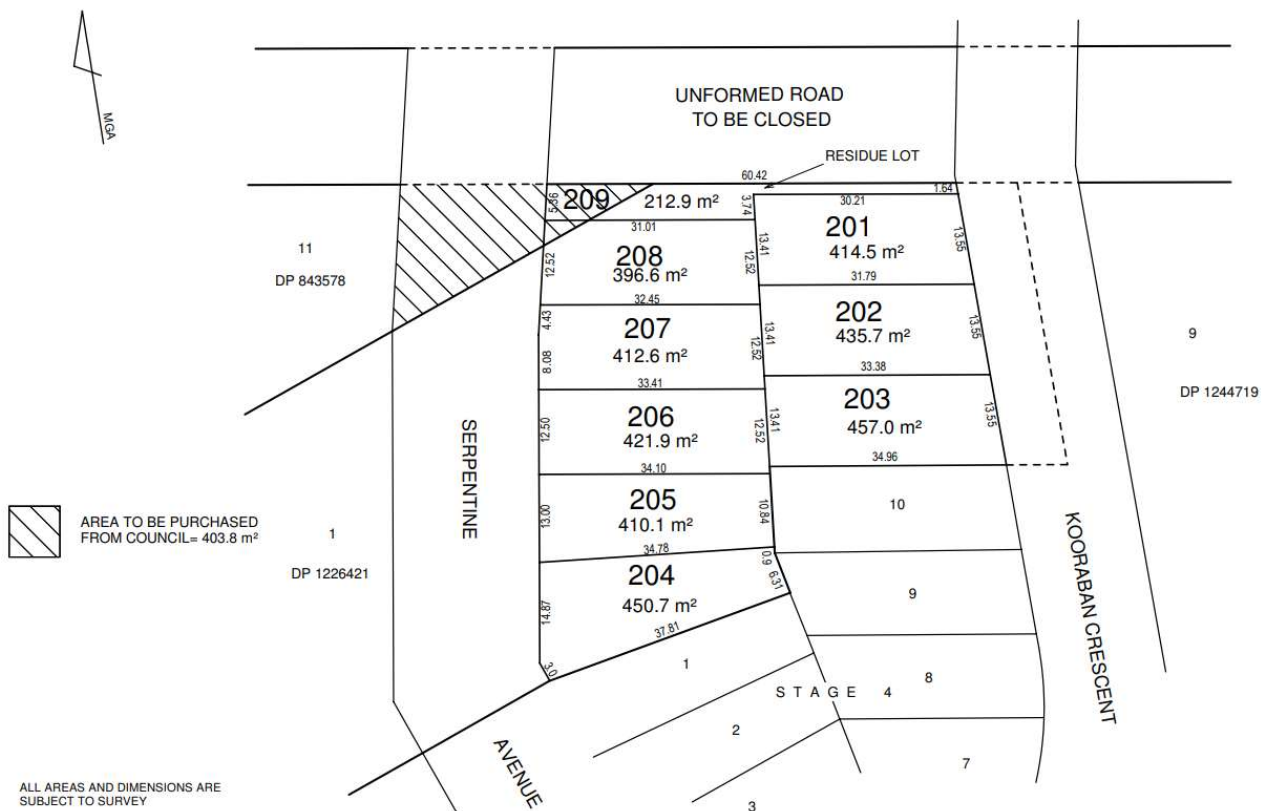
Proposed Subdivision Plan DA 454/2021/ZB
